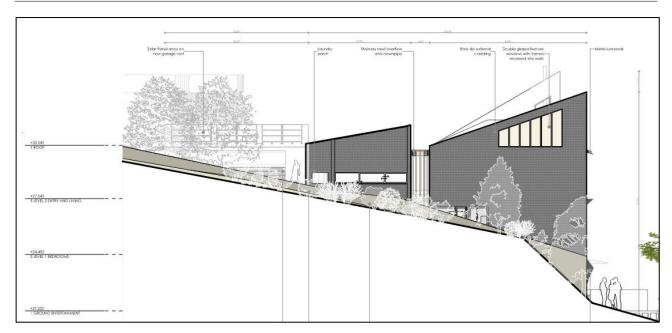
Eastern elevation (Source: fitzpatrick + partners architects)
